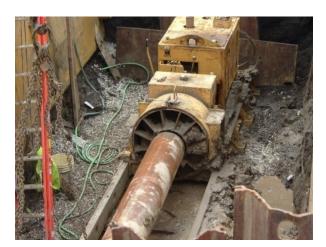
Pipe and auger boring machine as a new pipe segment is being fitted to the machine and welded to the pipeline
